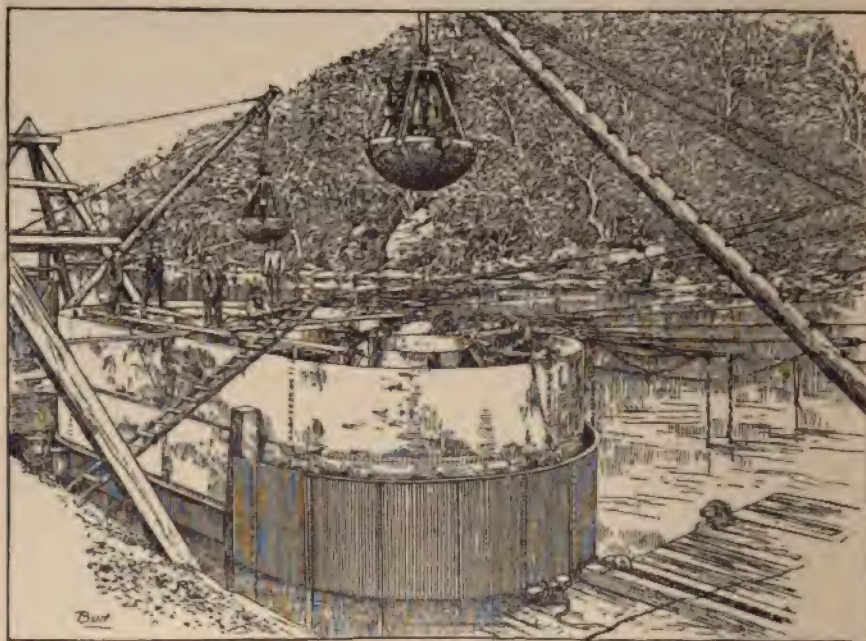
HAWKESBURY BRIDGE.—Caisson No. 6 in Process of Sinking, Showing Excavator and Shore Chains for Maintaining Vertical Position.
